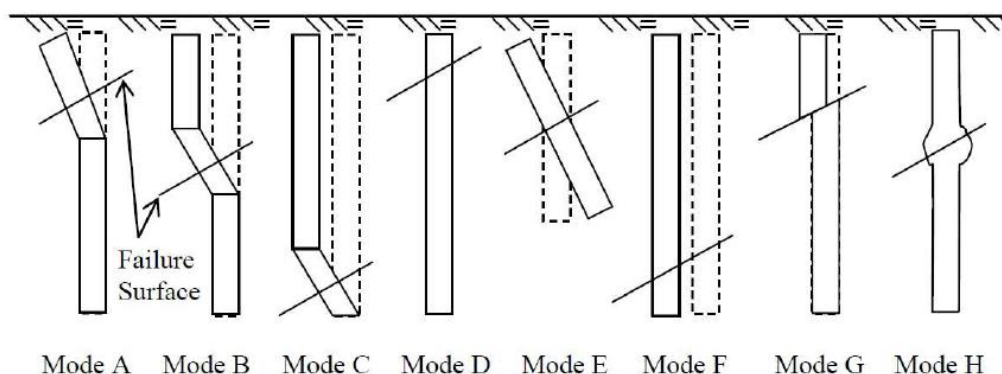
Potential Failure Models (redrawn by Filz, 2009 based on Kivelo and Broms, 1999)
